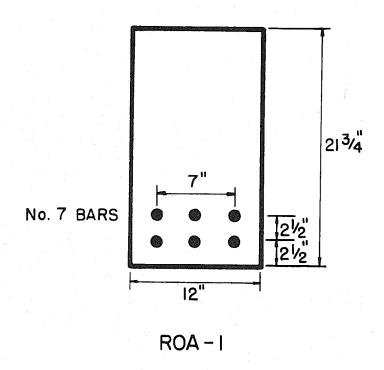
A BEAM CROSS-SECTIONS WITH WEB REINFORCEMENT
